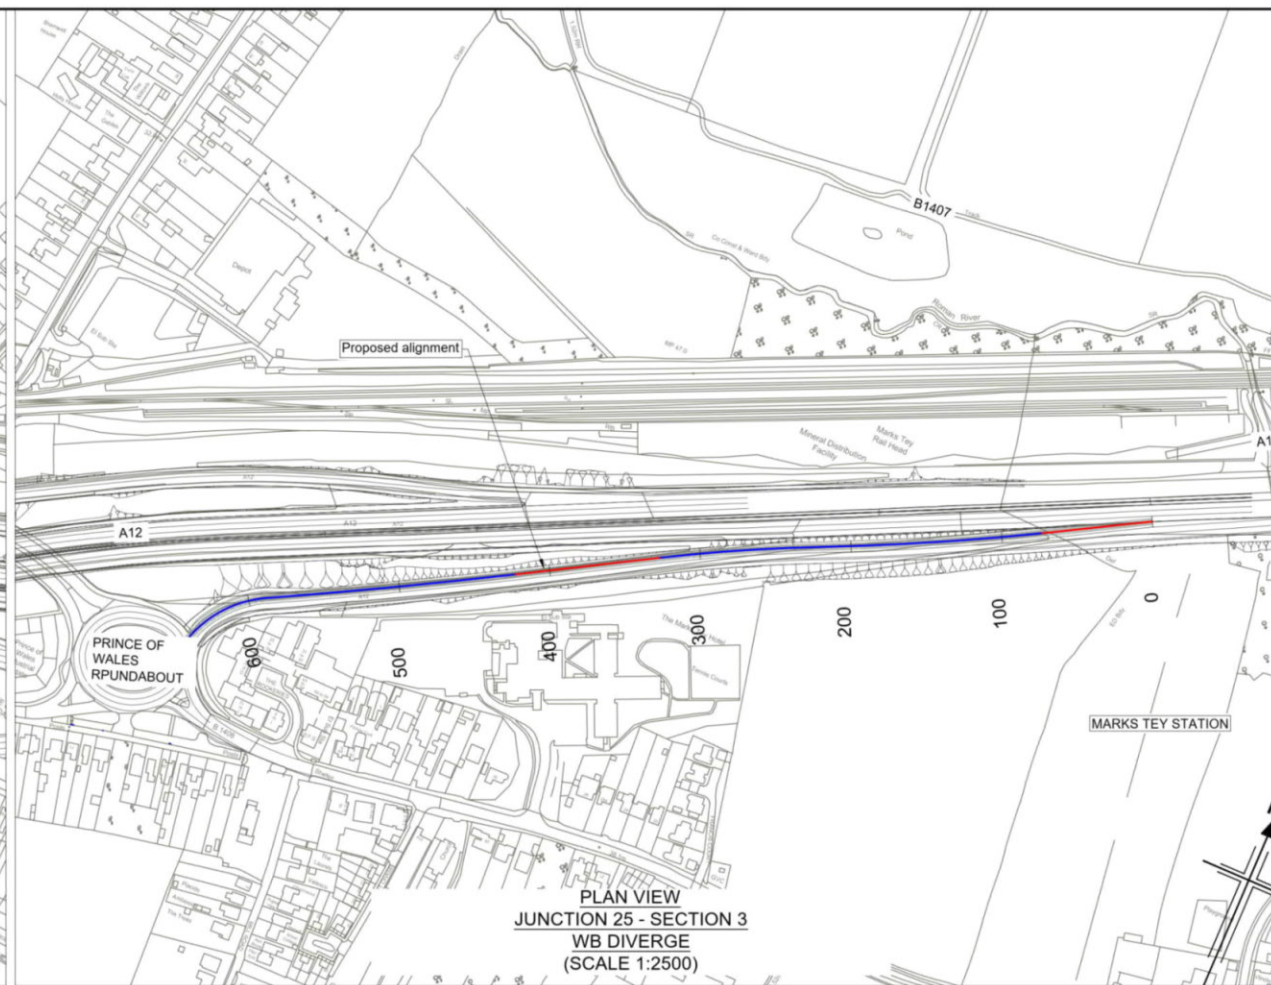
Drawing number: HE551497 - JAC - HSR - S3_J25 - DR - C -0003
